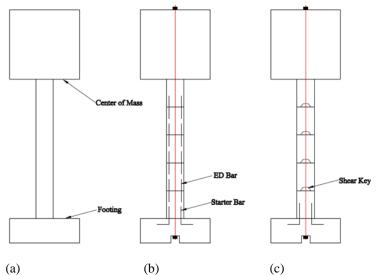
Schematic drawing, (a) typical monolithic column, (b) 5 segment column with ED bar, (c) 5 segment column with shear key (adapted from Li et al., 2018).
